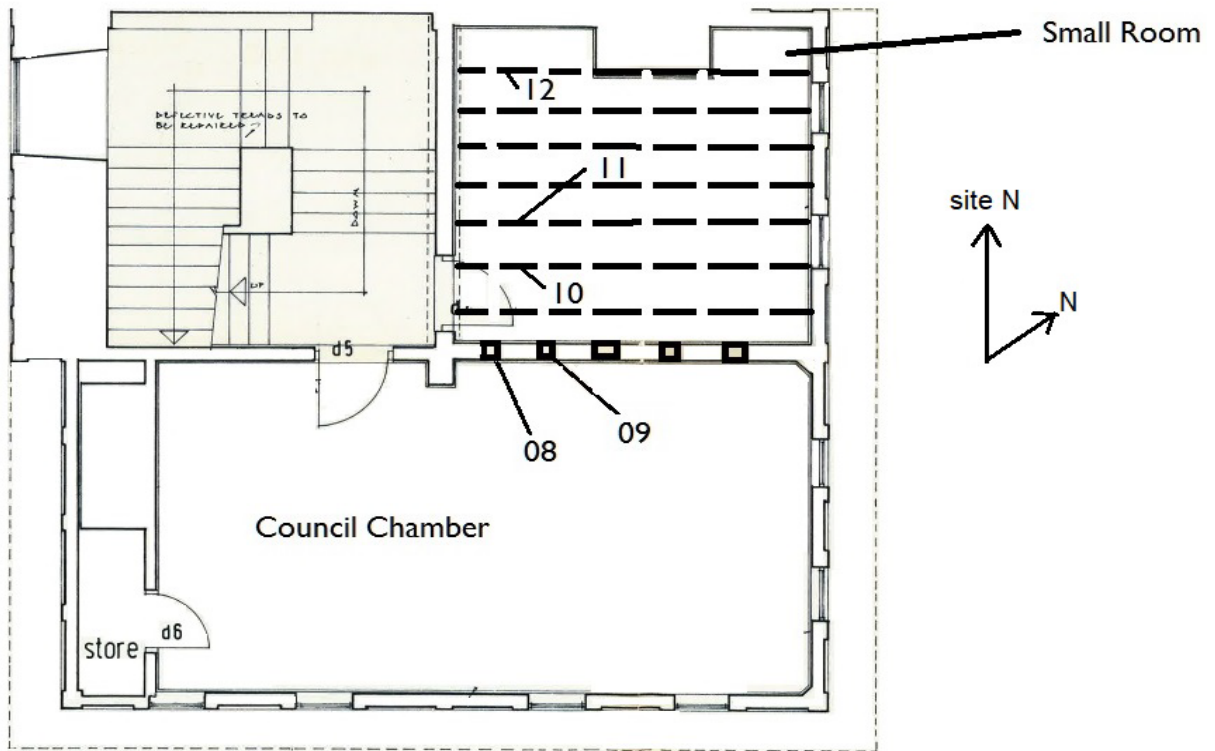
First-floor plan showing the approximate positions of timbers sampled for dendrochronology (adapted from Essex County Council plans drawn by R Crowe, 1974)
